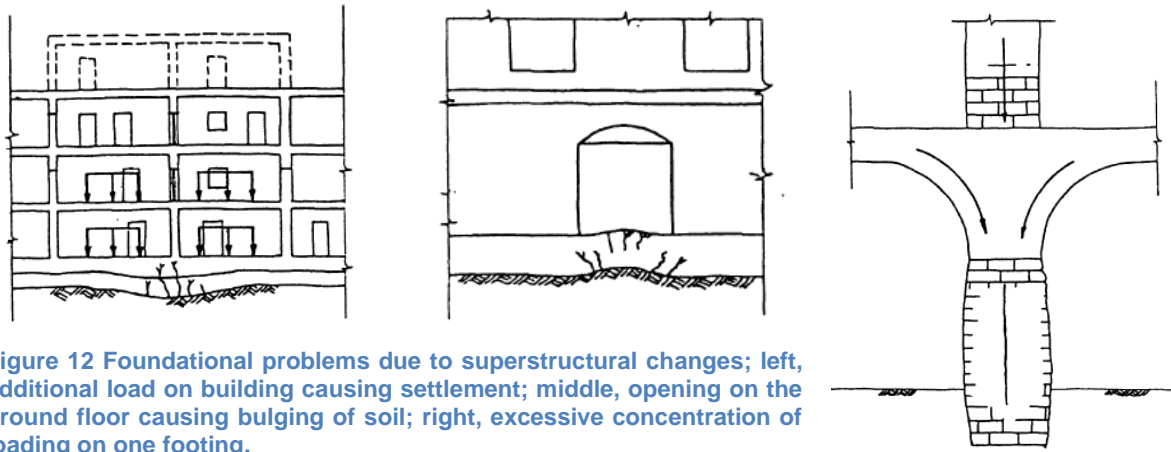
Foundational problems due to superstructural changes; left, additional load on building causing settlement; middle, opening on the ground floor causing bulging of soil; right, excessive concentration of loading on one footing.
